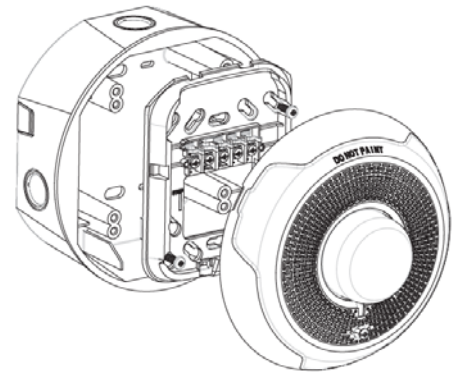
4-Wire Ceiling Mount Horn Strobes with Ceiling Surface Mount Backbox
